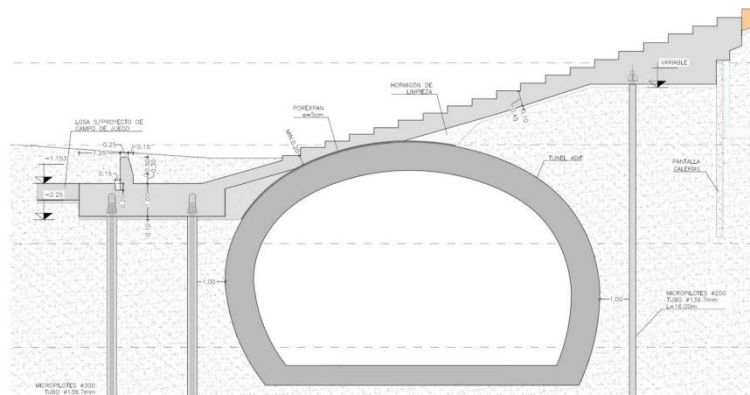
Cross-section of the structural grandstand and tunnel on the east side (the reinforcement of the tunnel itself is not shown)
